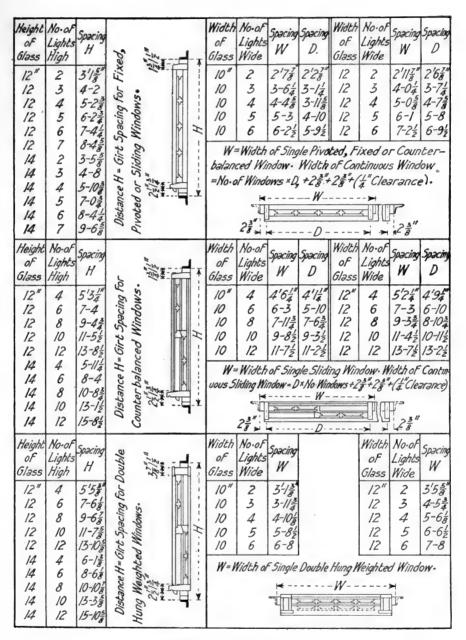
Dimensions for Glazed Wood Sash. American Bridge Company.
